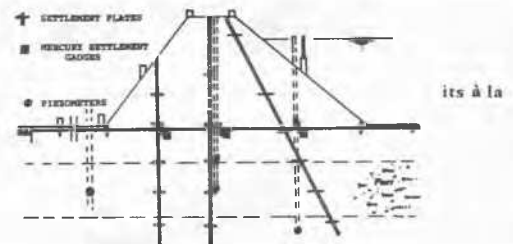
Details of instrumented section adjacent to the trial pit (Fig. 3(a)).
